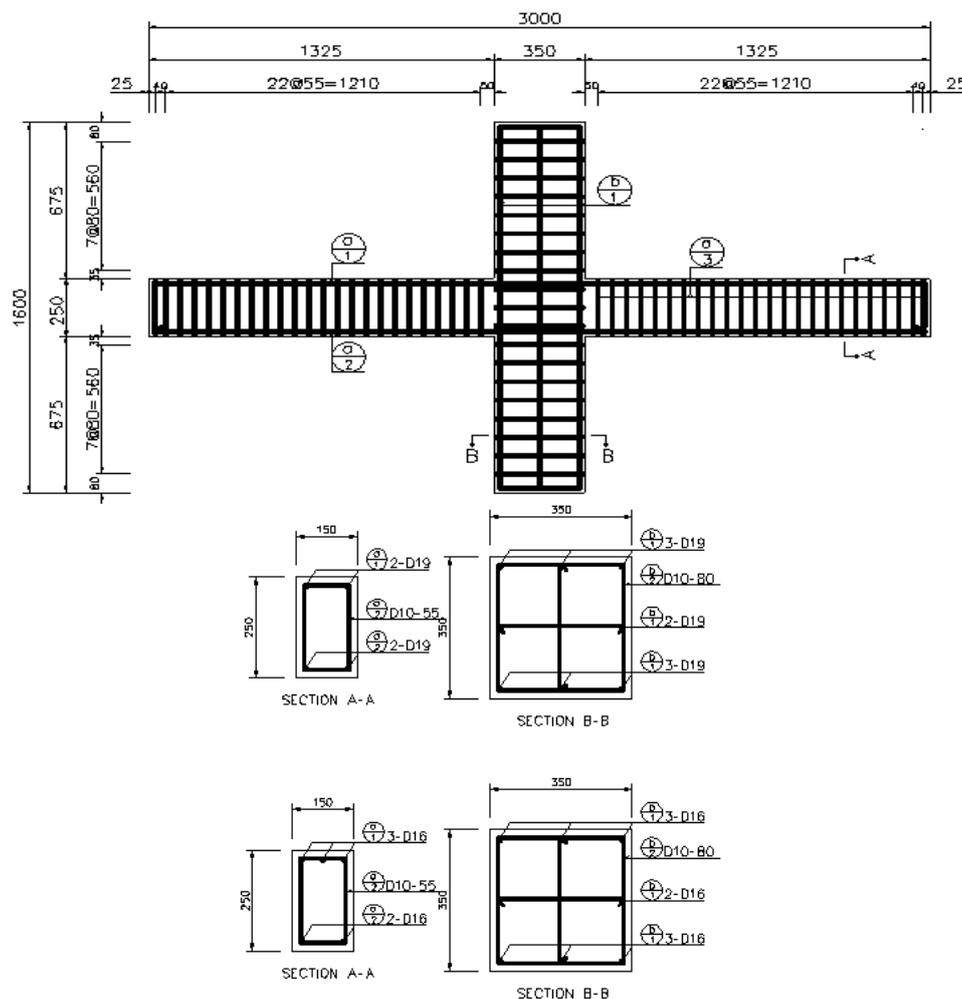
Specimens' details (Kurniawan et al), (a) Elevation view of the specimen, (b) Beam and column section for SD19 (Top) and SD16 (Bottom)
